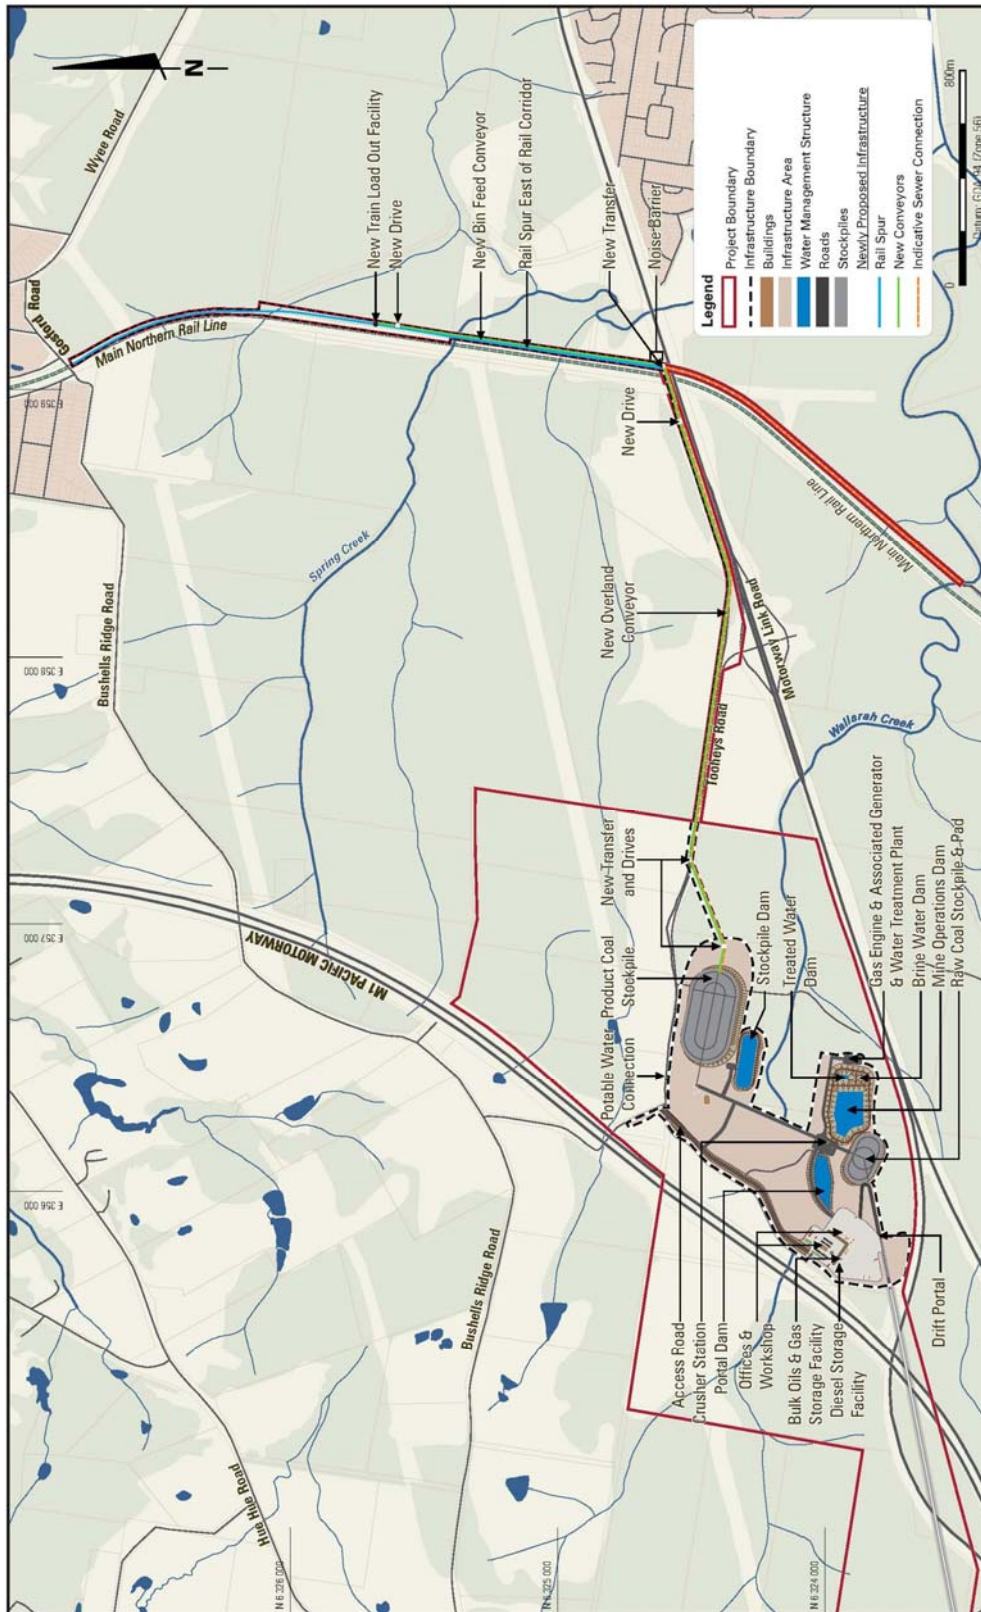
Conceptual Tooheys Road Site Layout (Source: Hansen Bailey)
